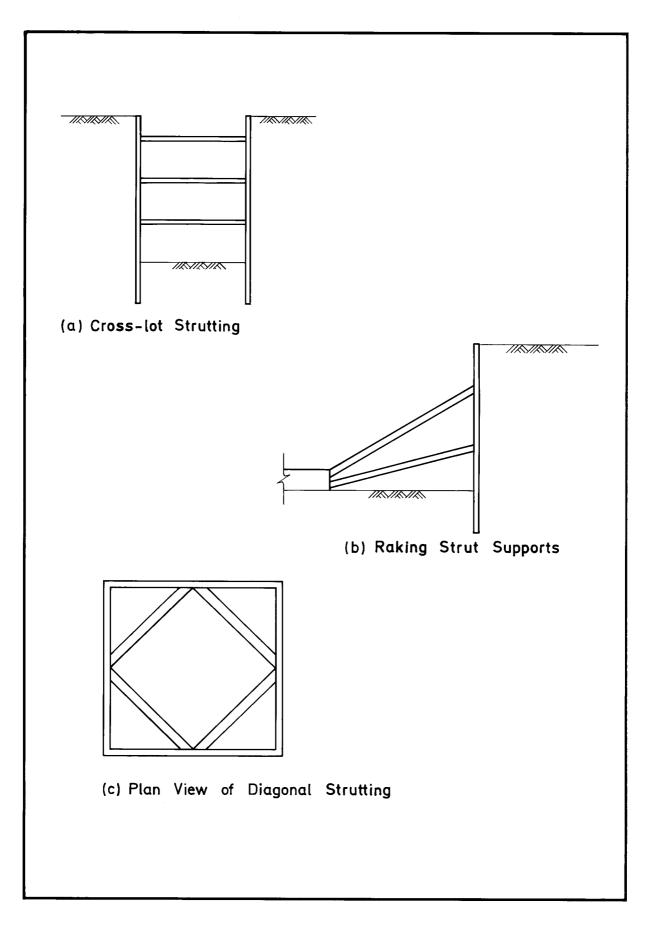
Strutted Wall Support Systems (Clough, 1975)
